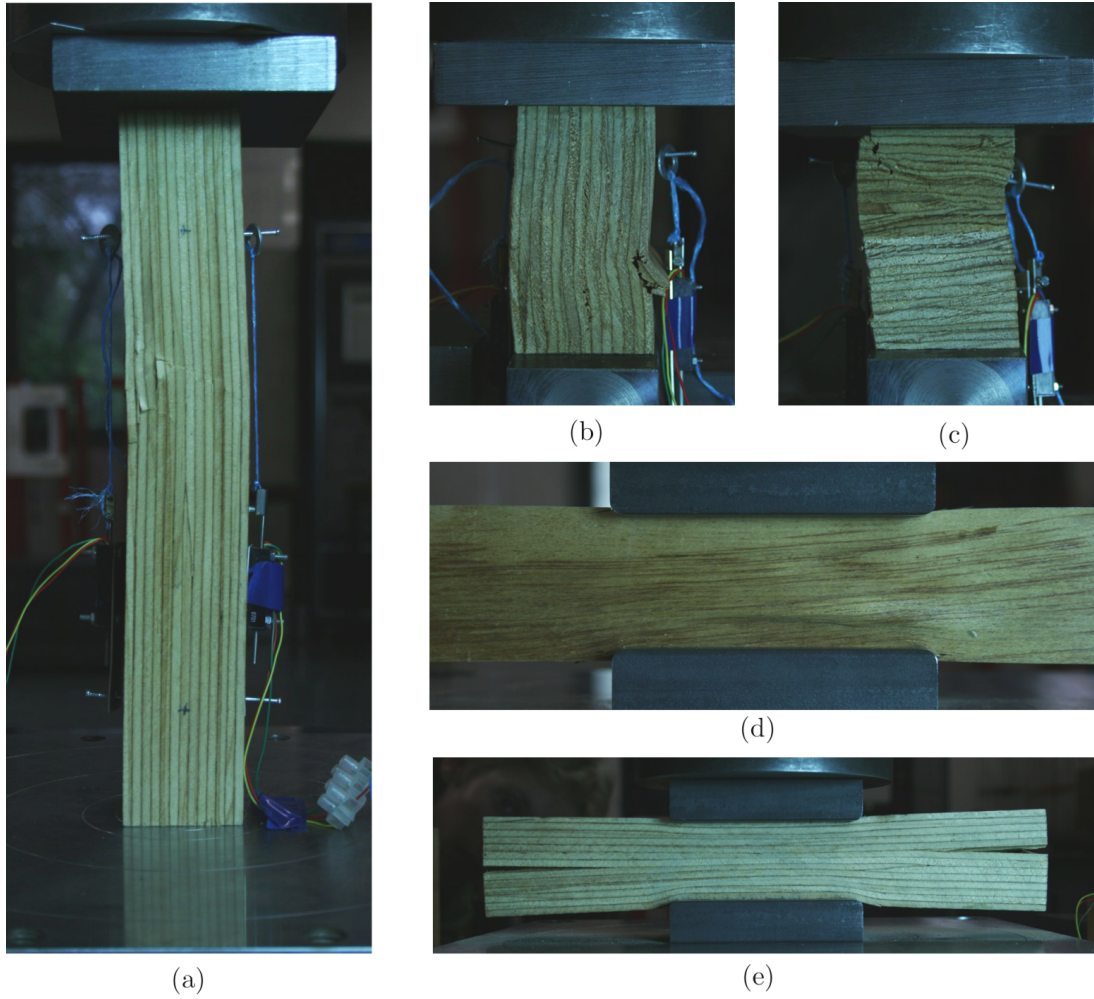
Typical failures of (a) longitudinally loaded specimen, E1-NZS; (b) tangentially loaded block specimen, E2-EN; (c) radially loaded block specimen, E3-EN; (d) tangentially loaded rail specimen, E2-NZS; (e) radially loaded rail specimen, E3-NZS
